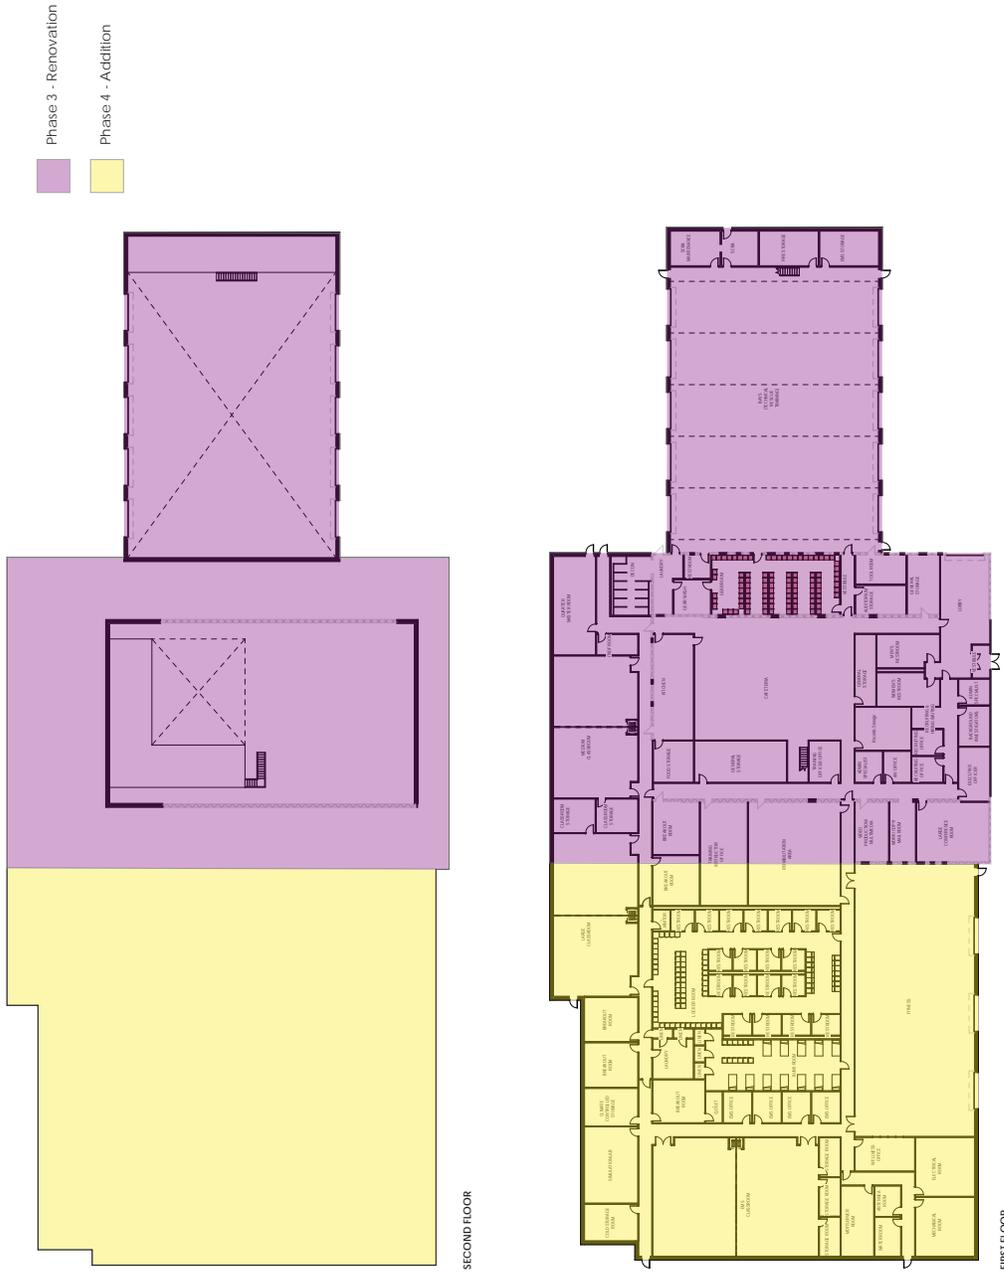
Floor Plan Concept Option 1 - Renovation & Addition - Phasing Plan
